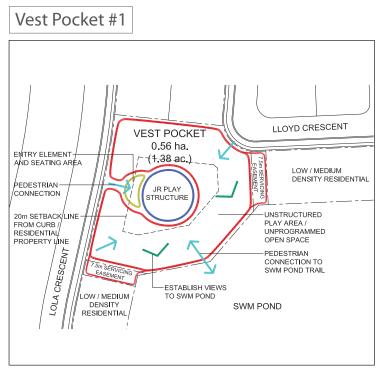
Vest Pocket #1 conceptual facility fit diagram (detailed design of the park will be determined at the subdivision landscape drawing review stage).
